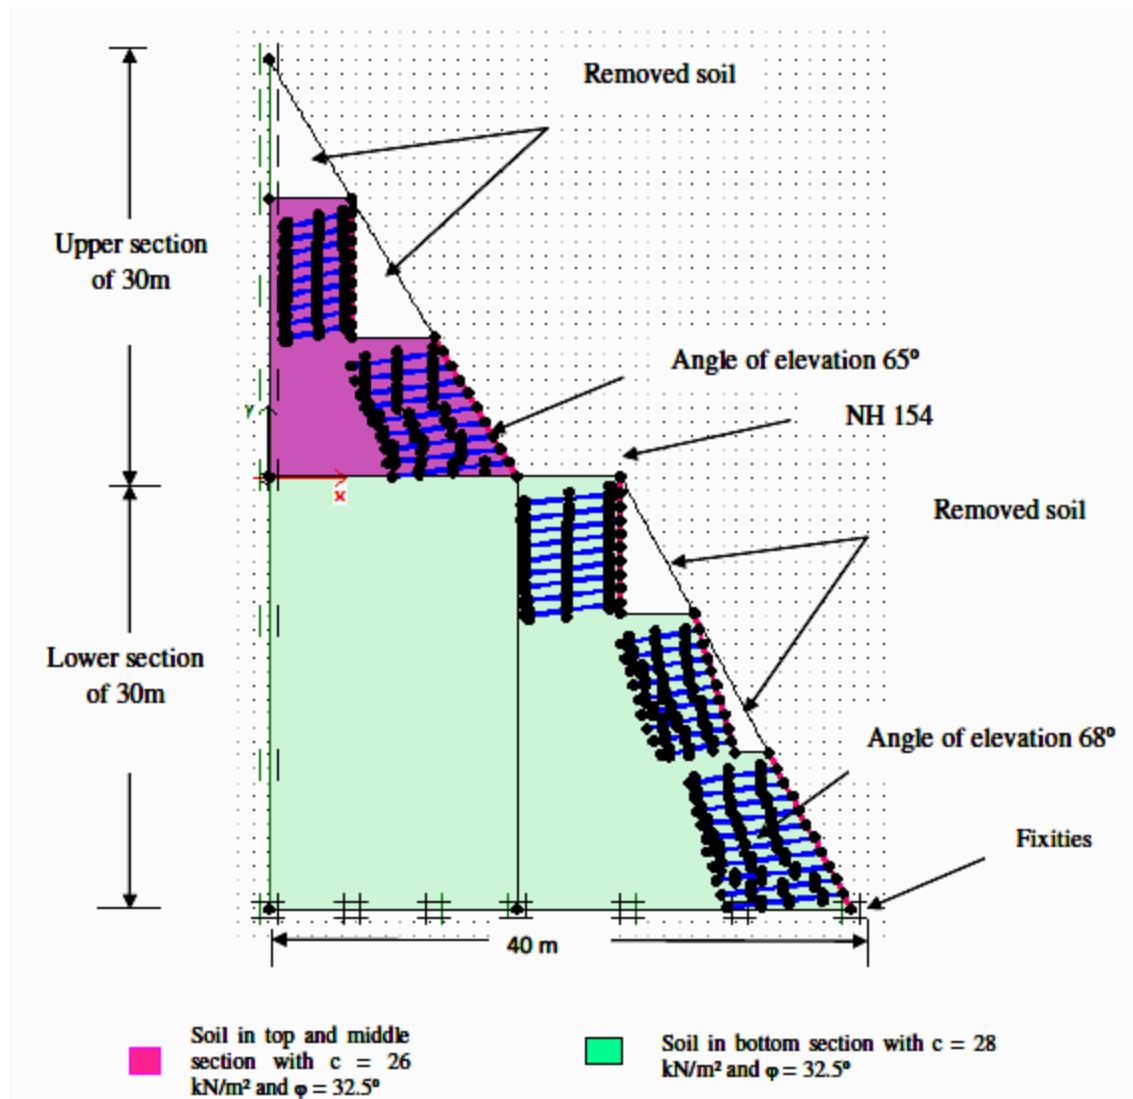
8 Geometrical Configuration of Finite Element model of Kotropi slope
